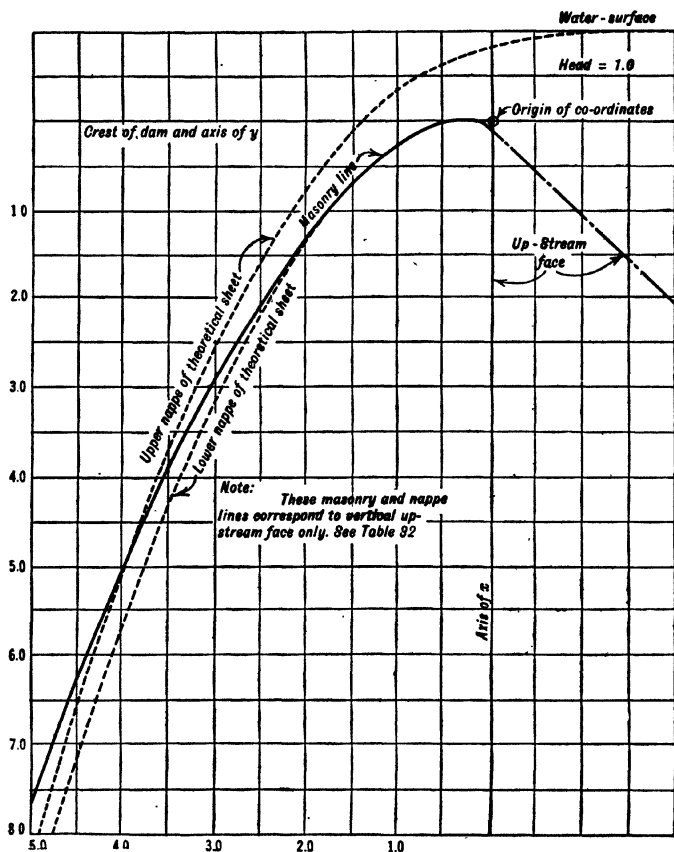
Recommended Shape of Crest and Downstream Face for Spillway Dams.
